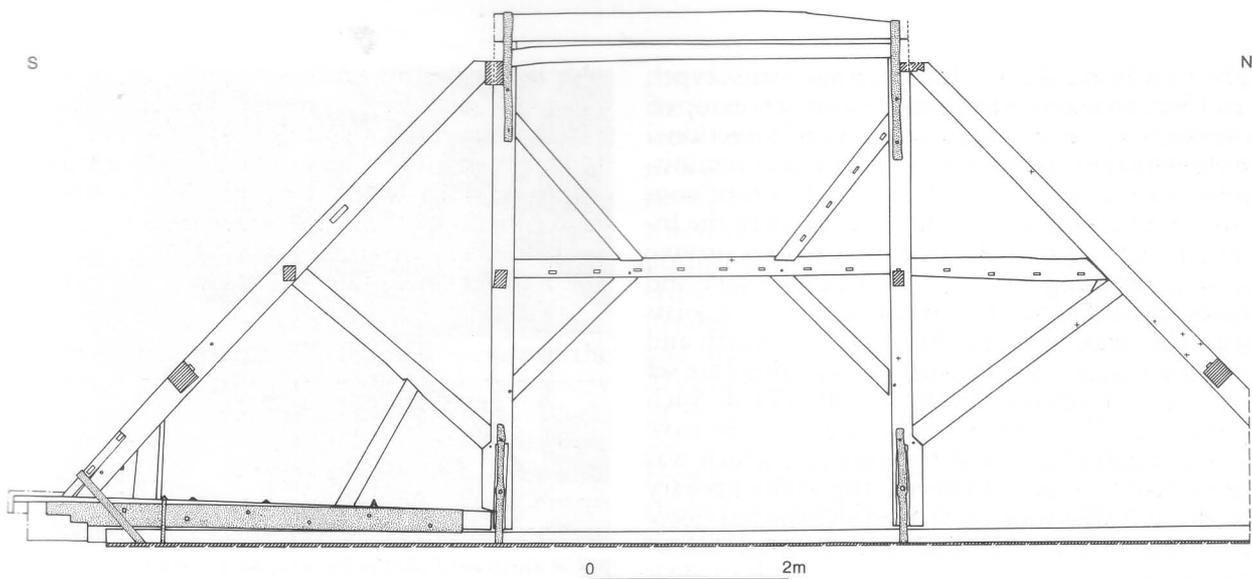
east-facing elevation of main truss at east end of roof. (S. Hurman)
